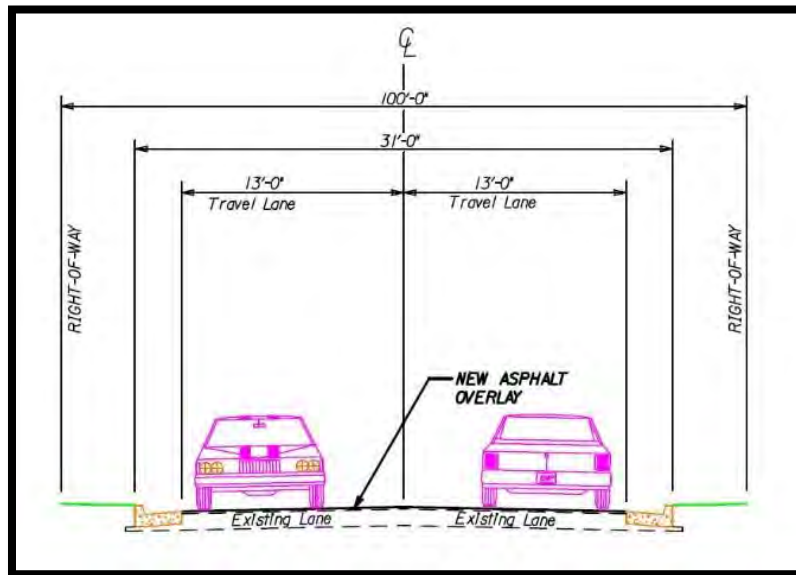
Proposed Typical Section – Alternative 4 & 5– Hook St. from Sixth St. to North Commons Street
